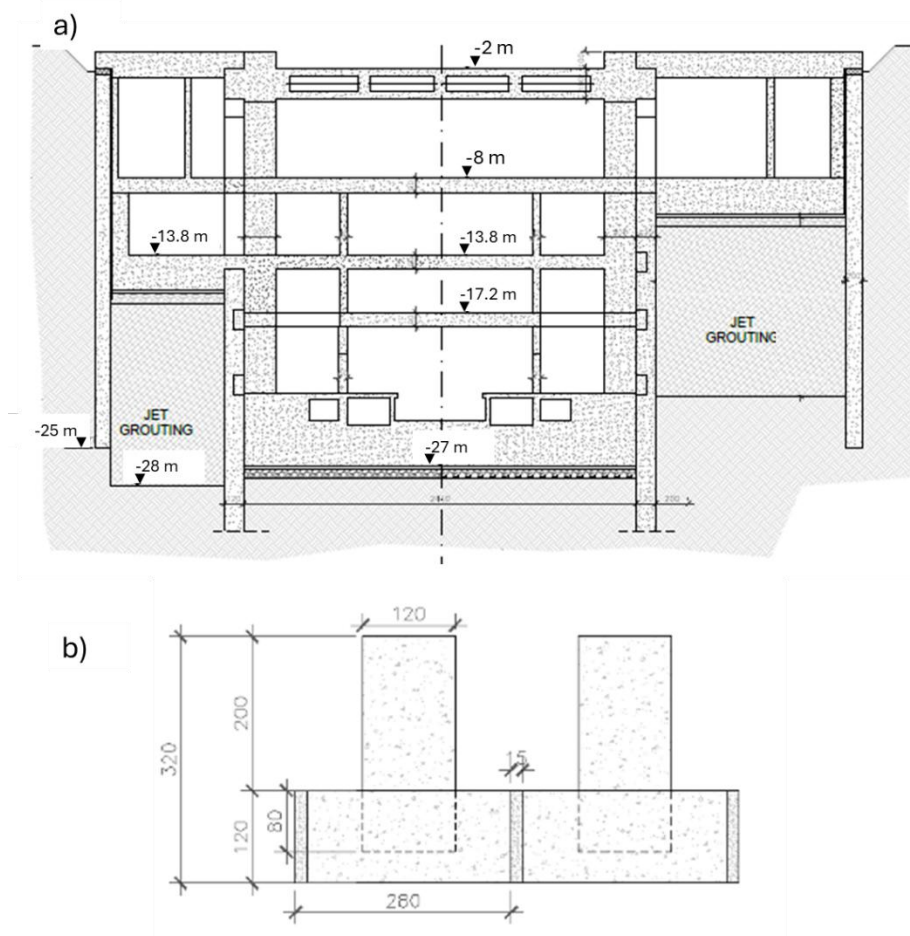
a) Section 1-1 (see Figure 70); b) cross section of diaphragm panels. Depths are reported in m bgl, dimensions of structural elements are expressed in cm.
